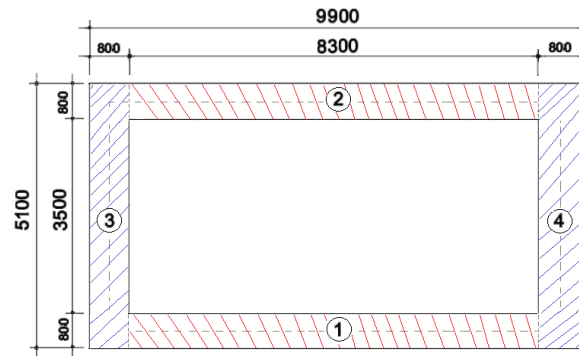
Foundation plan of the shallow concrete strip foundation with simplified loads
